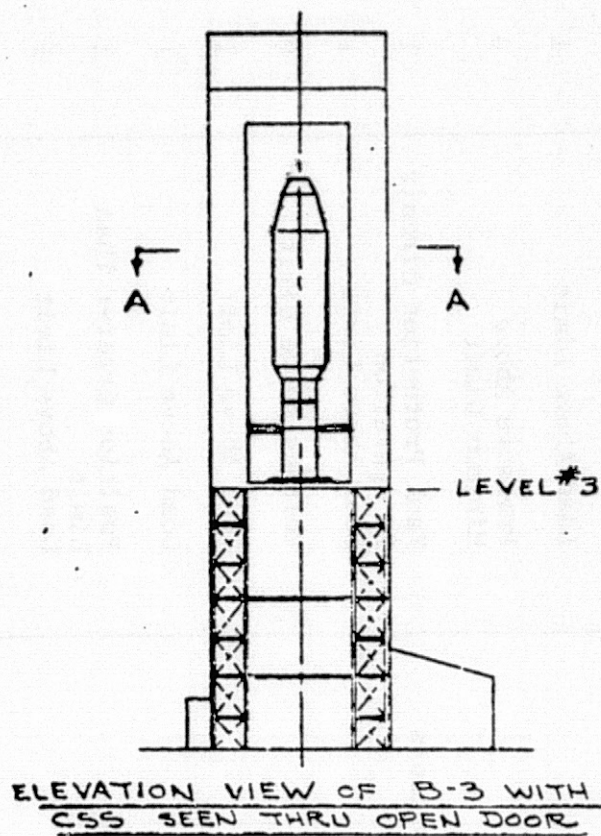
B-3 FACILITY TOWER STRUCTURE.
